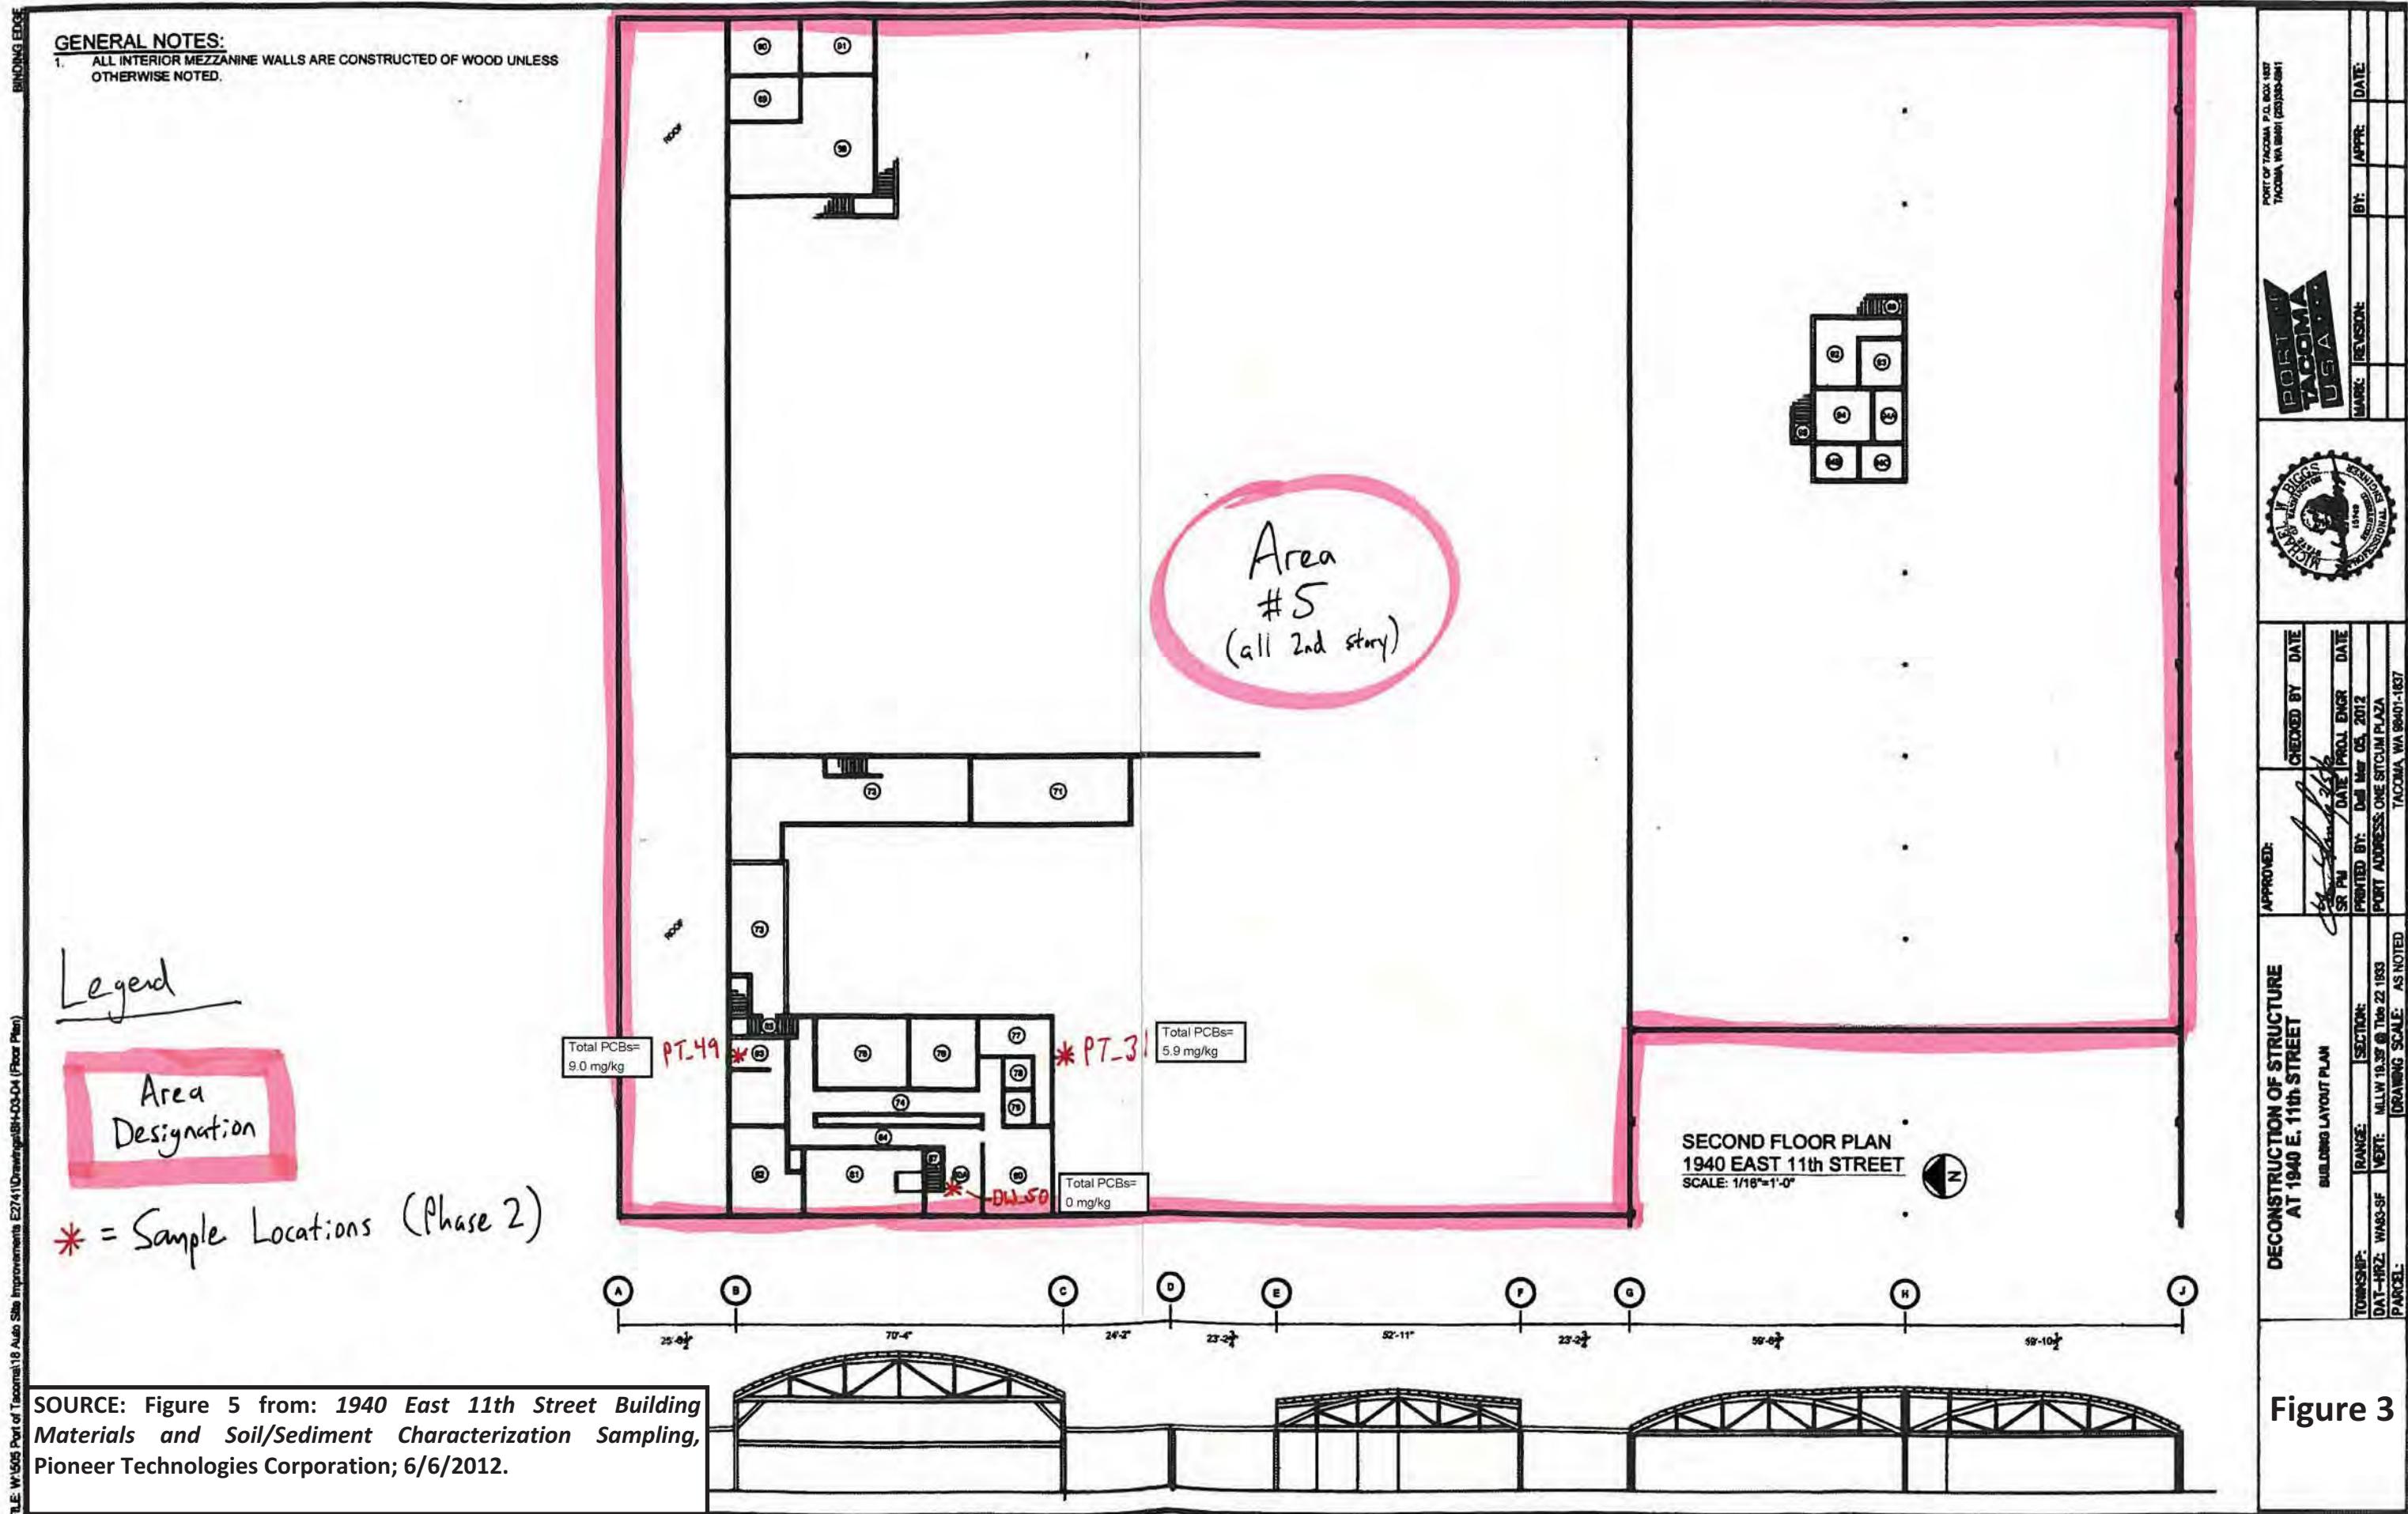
1940 East 11th Street Building 2nd Floor Sample Locations and Data
